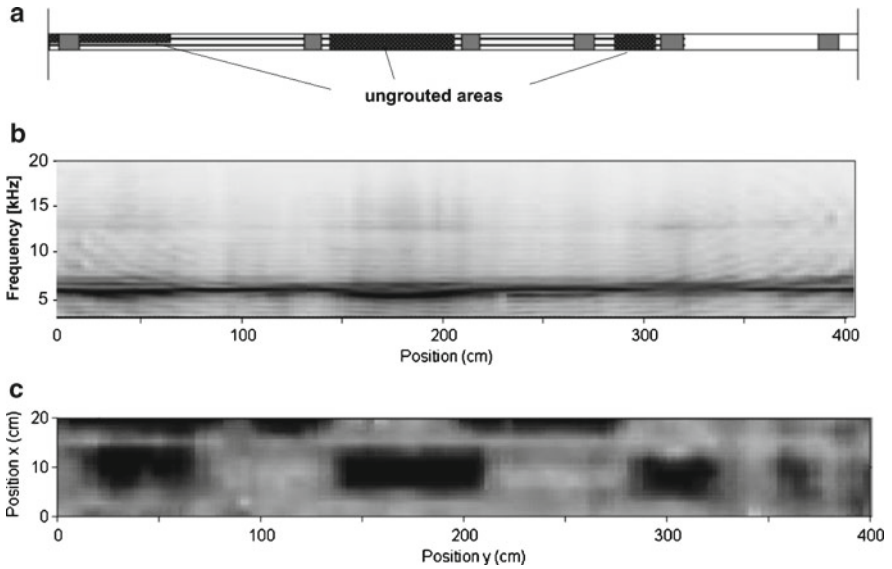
Impact echo imaging of tendon duct with artificial voids: a) plan, b) Impact echogramm (longitudinal section above duct, B-scan; backwall echo 6.16 kHz, shifted backwall echo around ducts., c) Depth section for shifted backwall echo (5.63 kHz) (after [Große et al, 2007])
